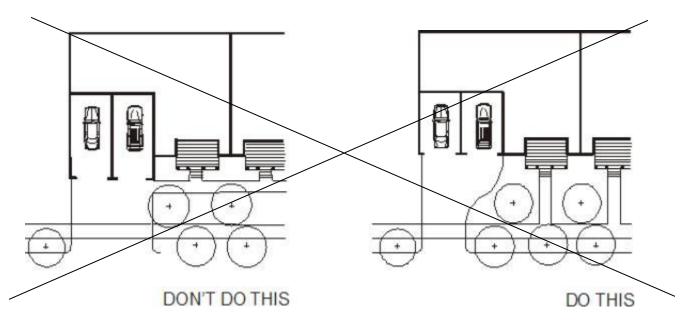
(F), (G): Example of limiting the impact of garage entrances by building them flush with the facade, reducing their width, providing landscaping, and pedestrian access.
